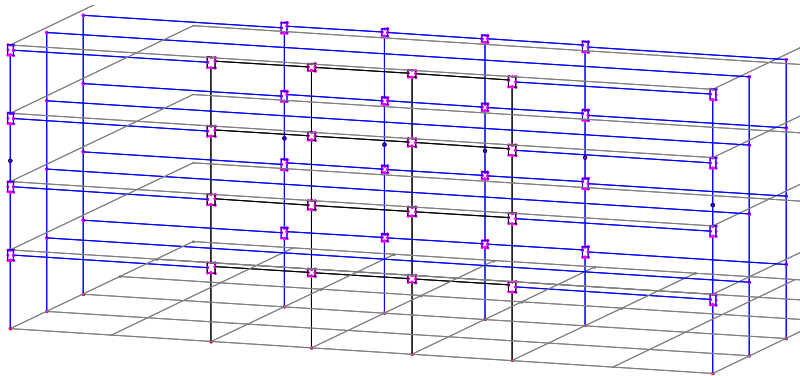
Finite element model of Type I non-ductile moment frame 4-story building
